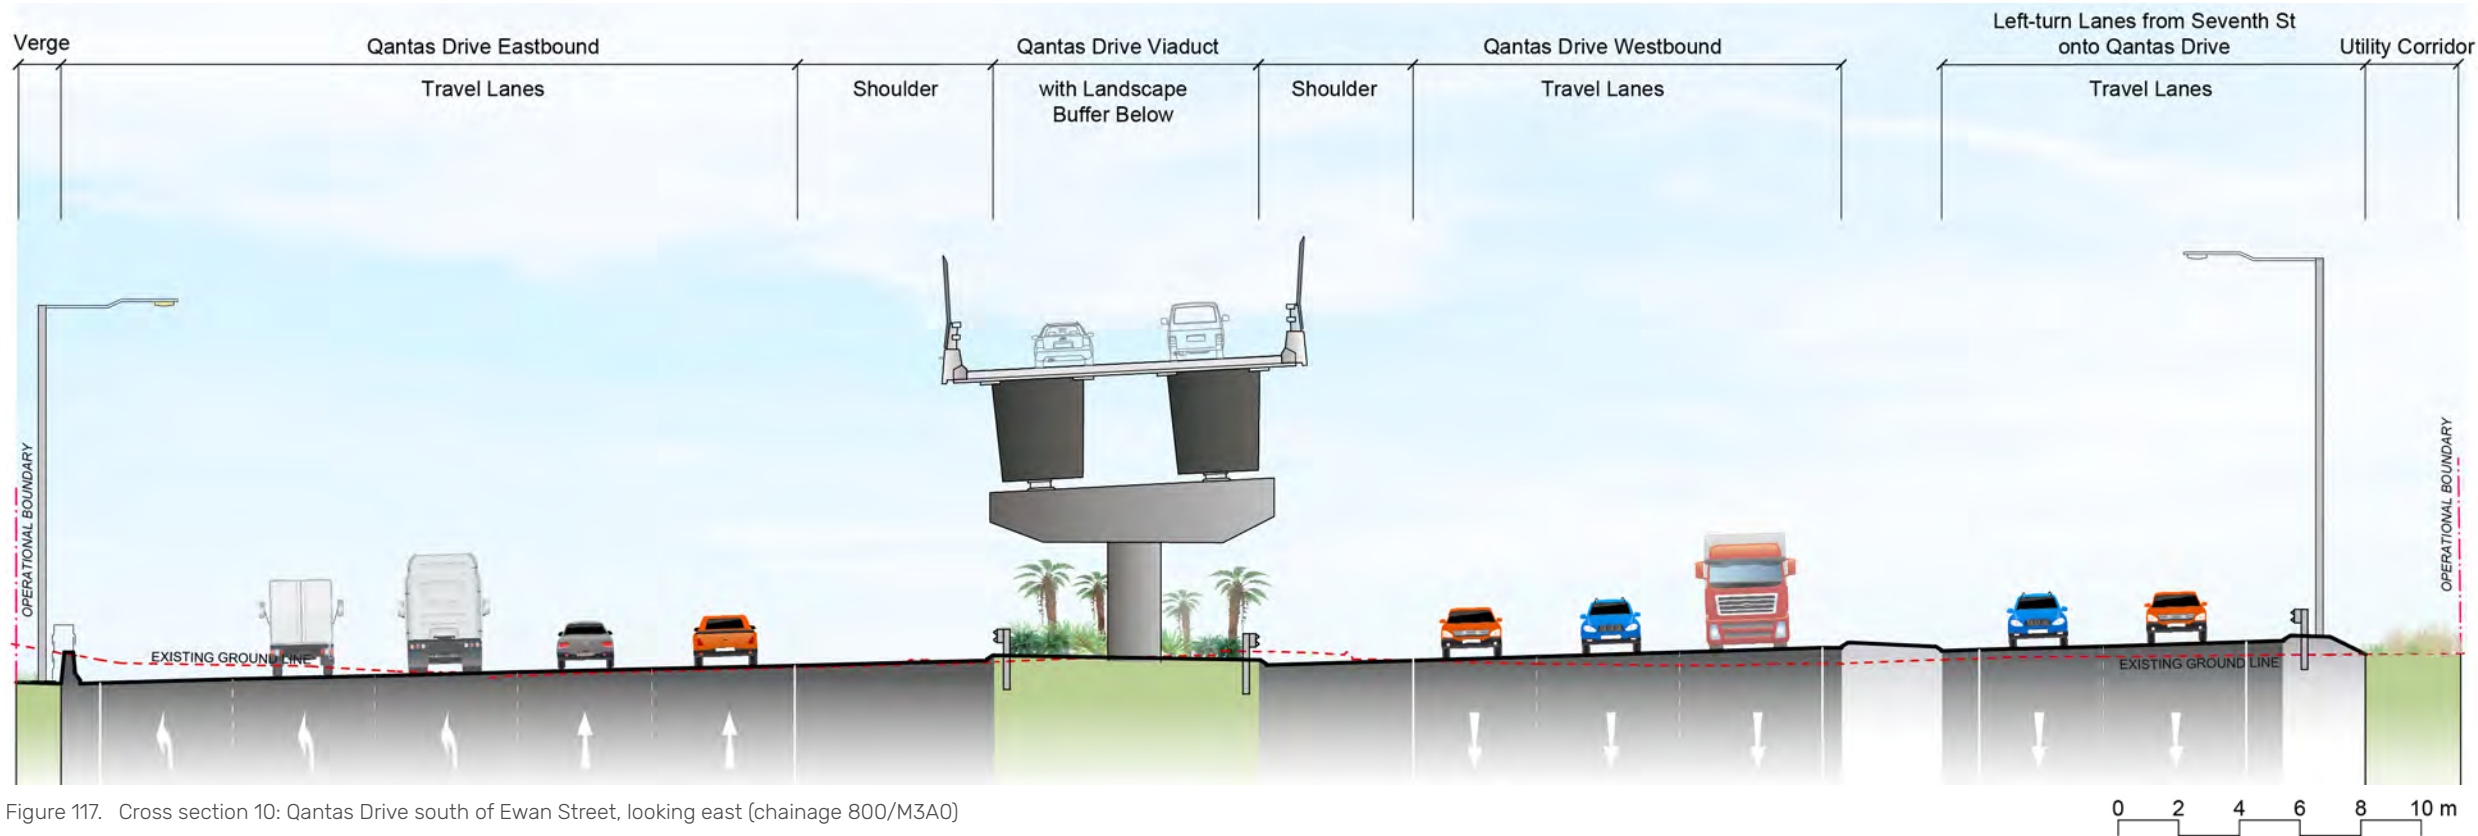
Cross section 10: Qantas Drive south of Ewan Street, looking east (chainage 800/M3A0)
